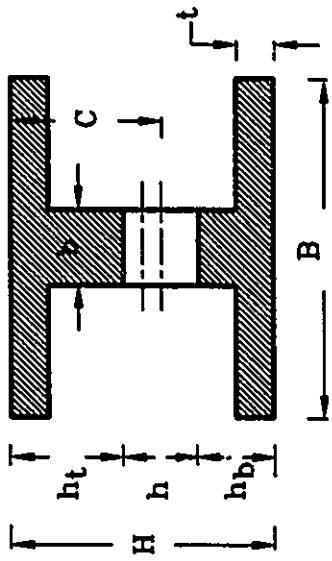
TYPICAL T-BEAM LAYOUT
